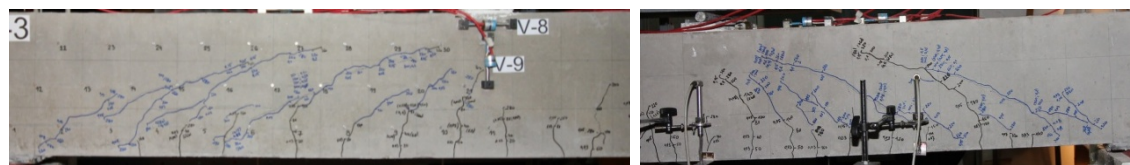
Crack pattern in a) the front side and b) the back side of the HVFAC-3 beam prior to failure
